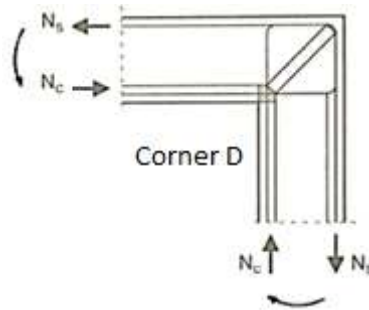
Closing moment (Walraven & Fennis, *Gewapend Beton (CTB2220)*, 2013).
